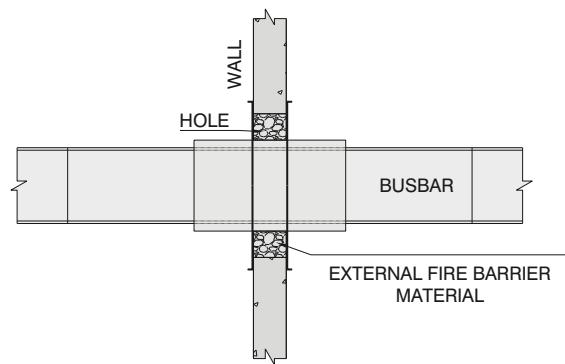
SAMPLE WALL CROSSING WITH FIRE BARRIER
